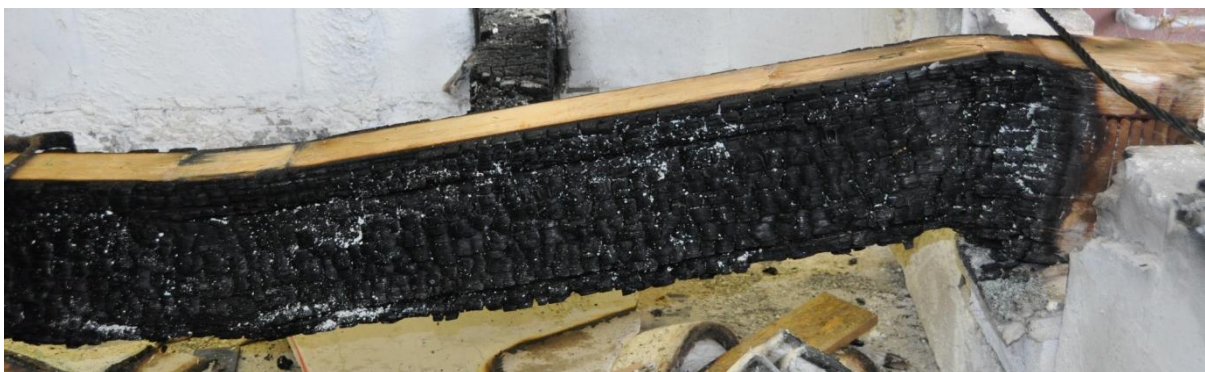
Beam C shown from the opposite side of the beam after failure.
